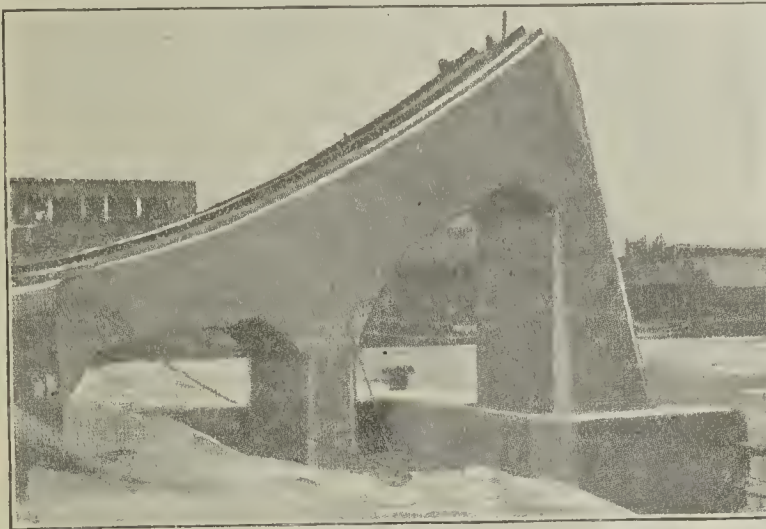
REINFORCED CONCRETE "KICKUP."
